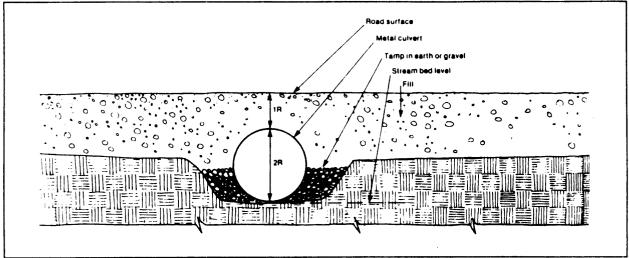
Culvert installation in streambed (Hynson et al., 1982).
